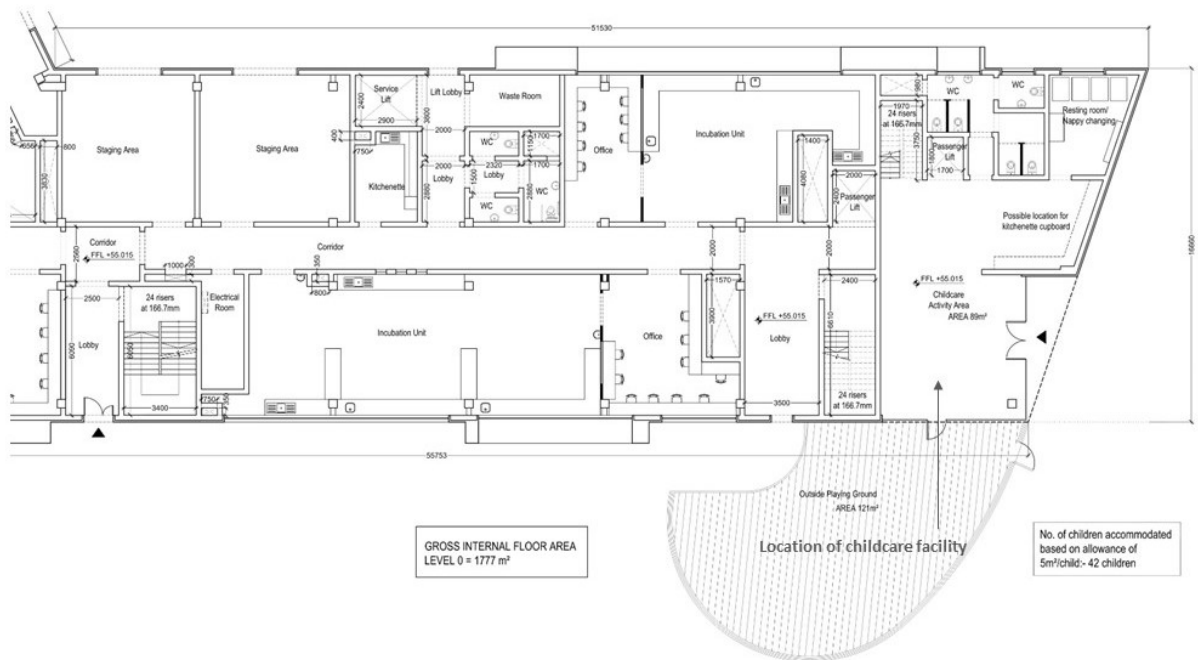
| LS3 floor plan highlighting the location of the childcare facility
